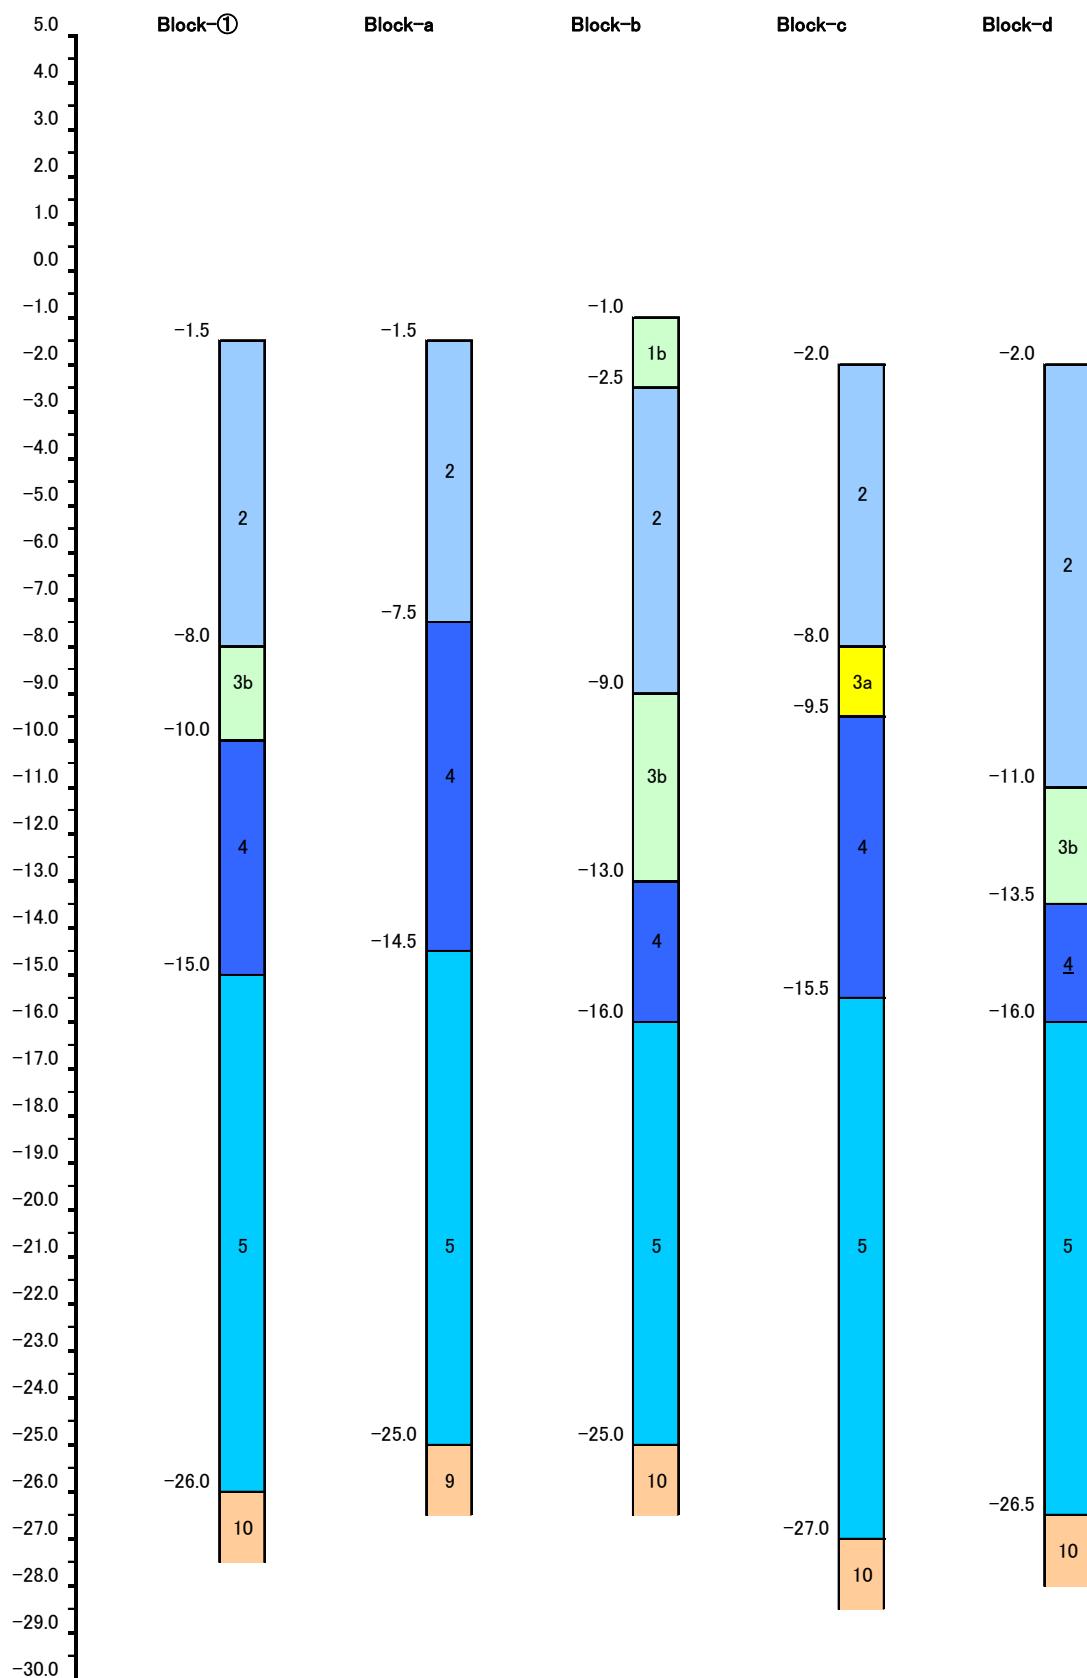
Model of Soil layer for Examination (behind earth retaining wall)
